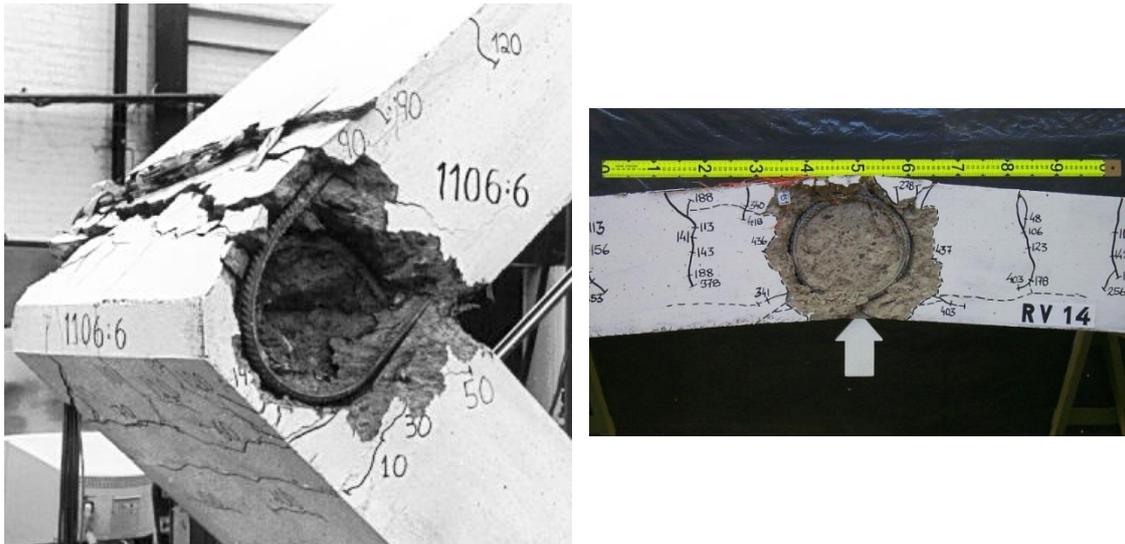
Possible failure due to spalling of side concrete cover for a frame corner subjected to a closing moment. Photos from Johansson (1996) and Grassl (1999), respectively.
